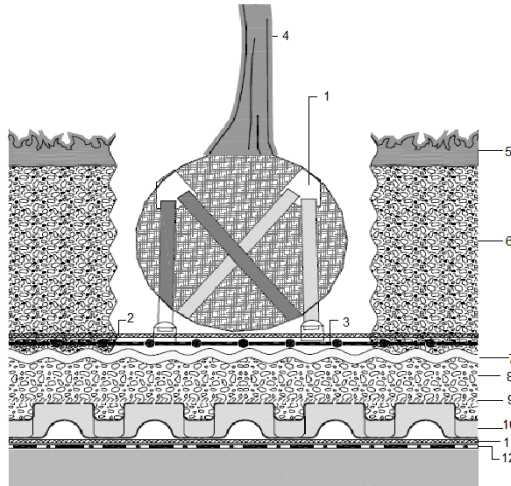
, 1. Root ball anchorage.2. Biodegradable fiber ,e.g. coco-material (optional) .3 .Reinforcement steel mesh.4. Tree.5. Lawn.6. System Substrate.7. Drainage pipes.8. mineral substrate.9. Filter Sheet .10. Drainage Element, filled with mineral substrate.11. Protection Material .12. Roof construction with root-resistant waterproofing.
